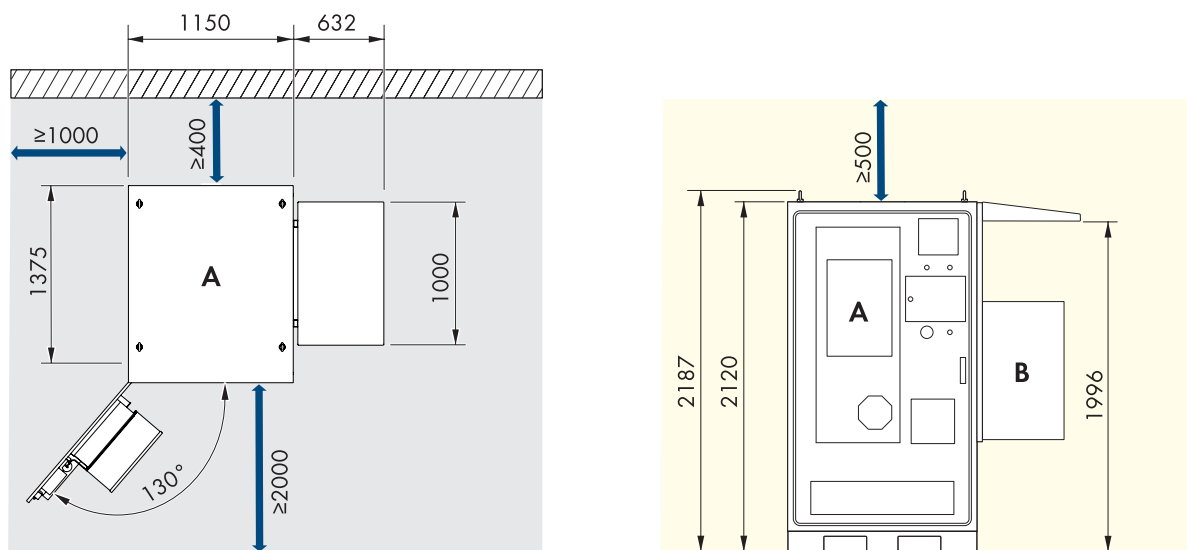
Example for installation of a system with one battery cabinet (dimensions in mm)
